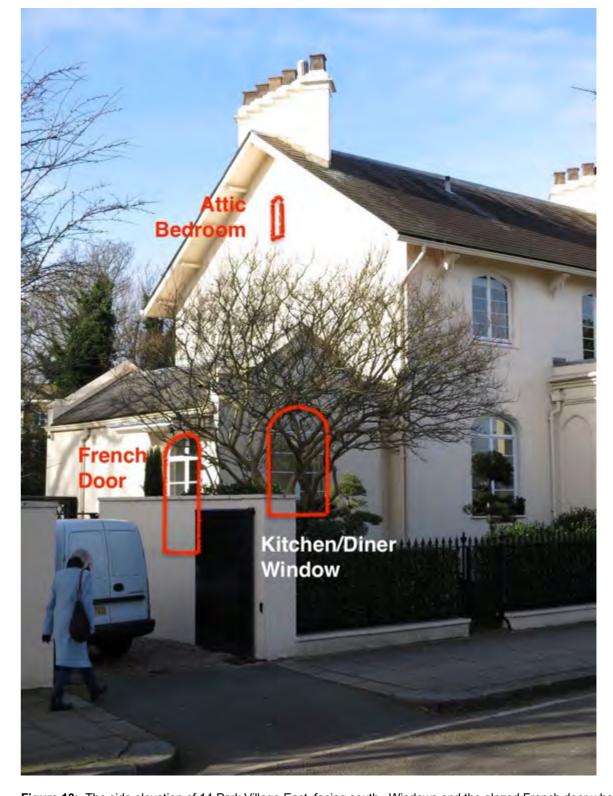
The side elevation of 14 Park Village East, facing south. Windows and the glazed French door where <u>internal</u> secondary glazing will be installed are annotated in red.
